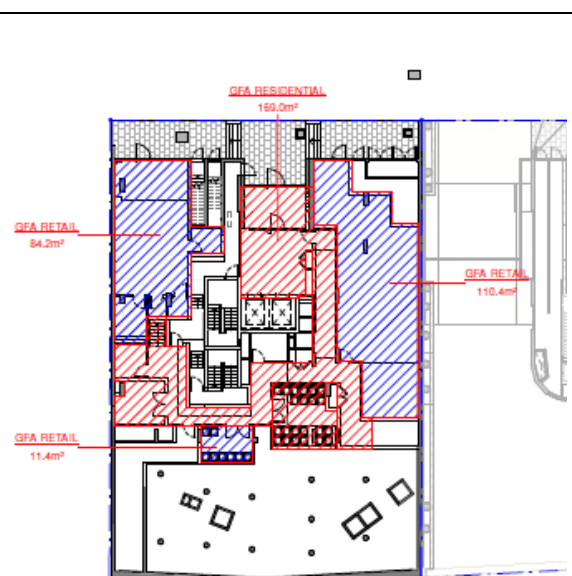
Proposed GFA on the ground floor (Mod2021/0137)
